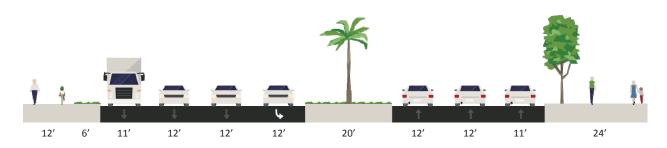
Meridian Avenue Typical Cross-Section, between Washington Street and Whiting Street
